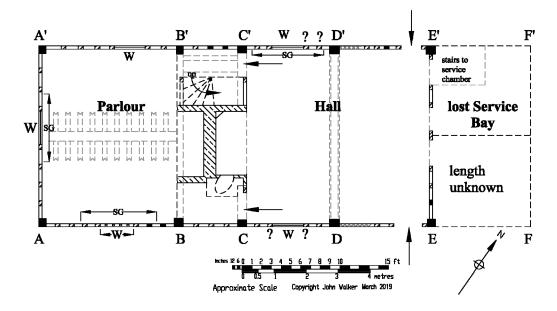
Original ground plan of Moss Farmhouse, Worlingworth in 16th century
